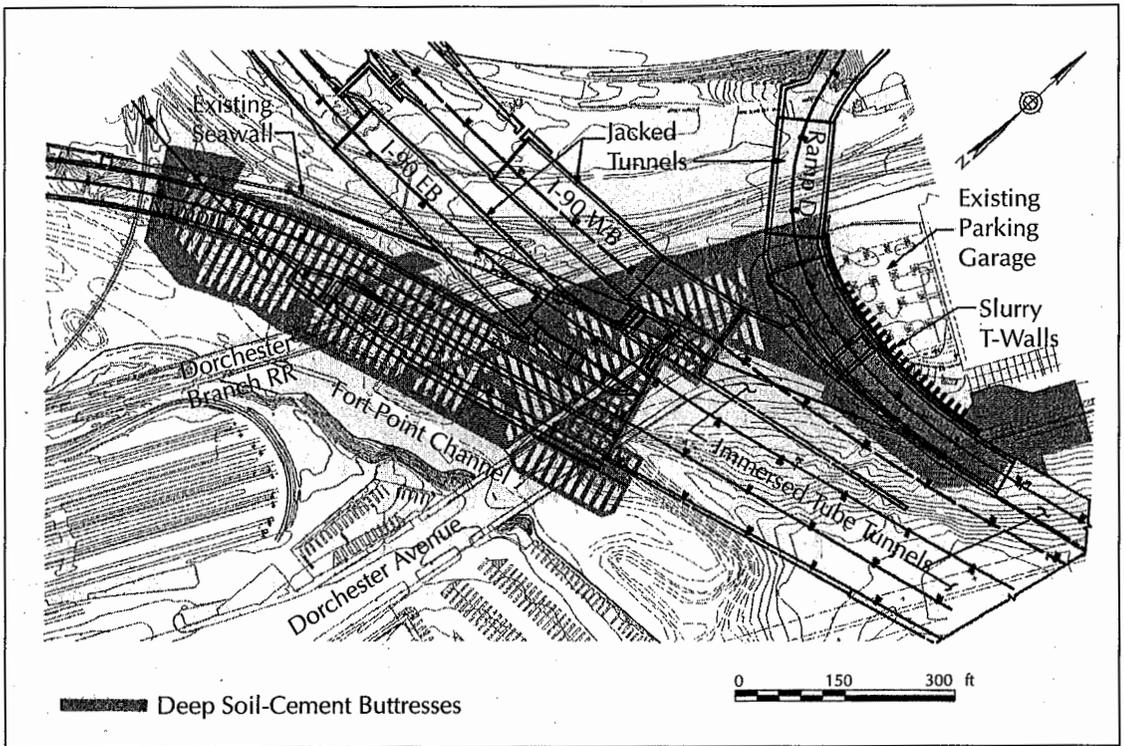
Use of a soil-cement berm to buttress the Ramp L tunnel.
